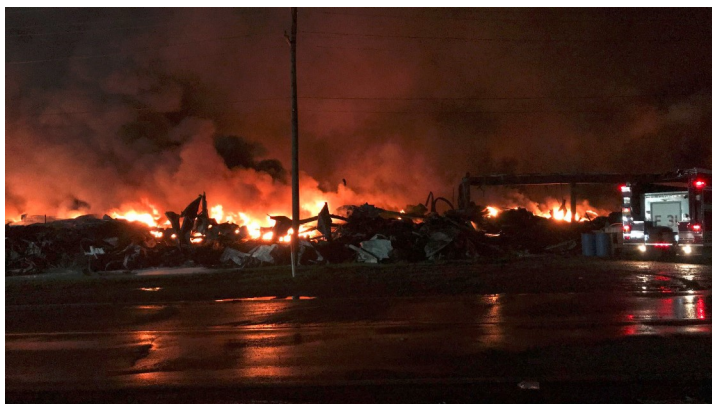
; Taken on 10/21/17 at 23:22 hours by START- [REDACTED] Facing E. The view of the destruction and fire at the Ames Warehouse Site.
